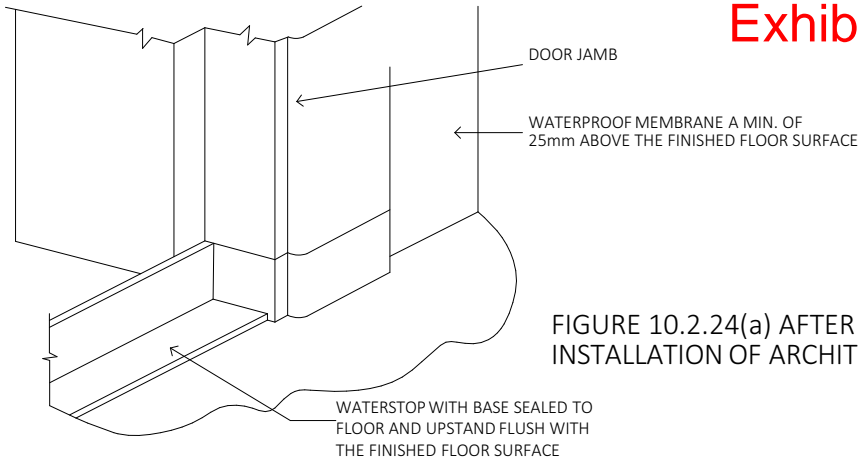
(a) AFTER INSTALLATION OF ARCHITRAVE
